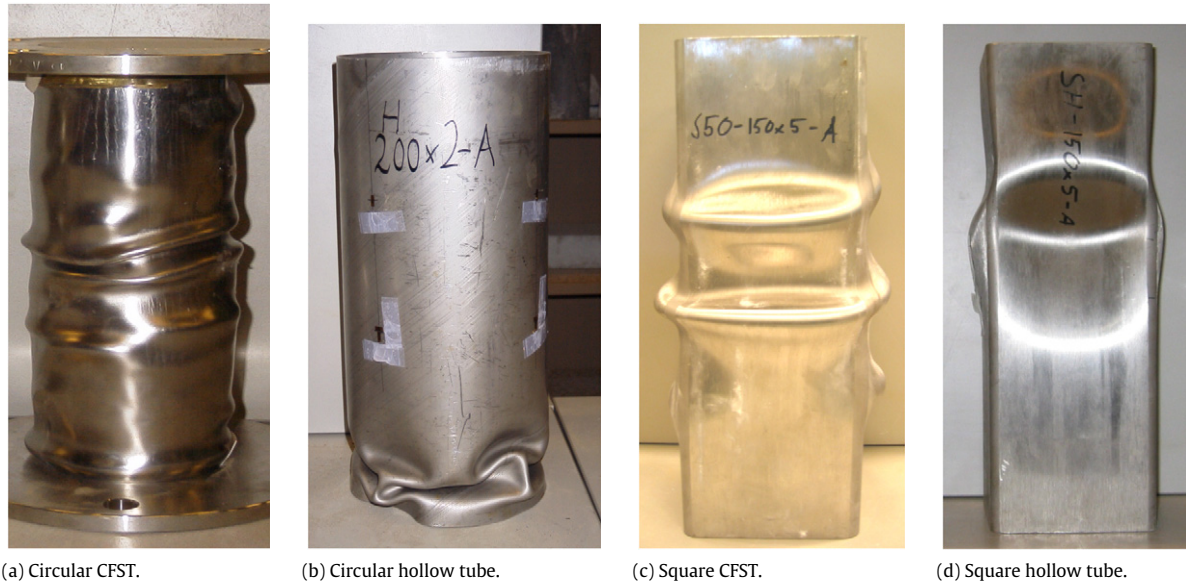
Failure modes of CFST stub columns and hollow tubes.
